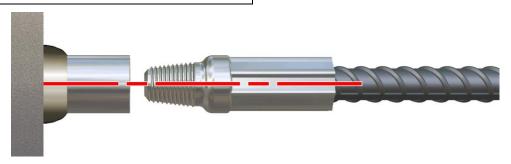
WELDING STRUCTURAL CONNECTOR
